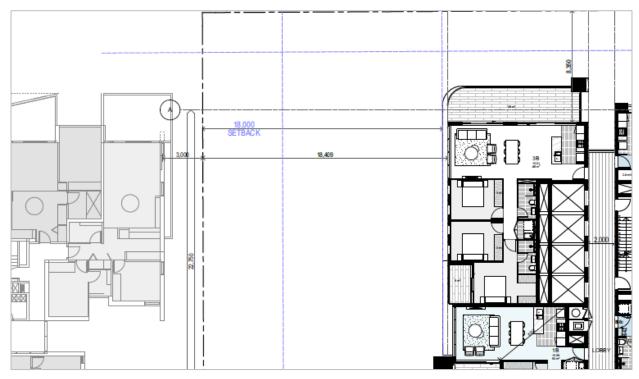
Extract of Level 10 floor plan showing building separation and setbacks (Source: Urban Link)
